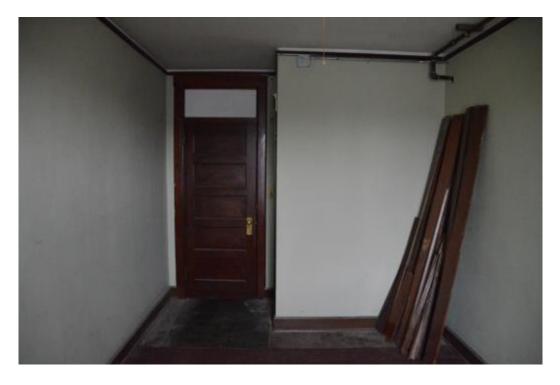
Looking Toward Closet and Door to Hallway - Typical SRO Room
